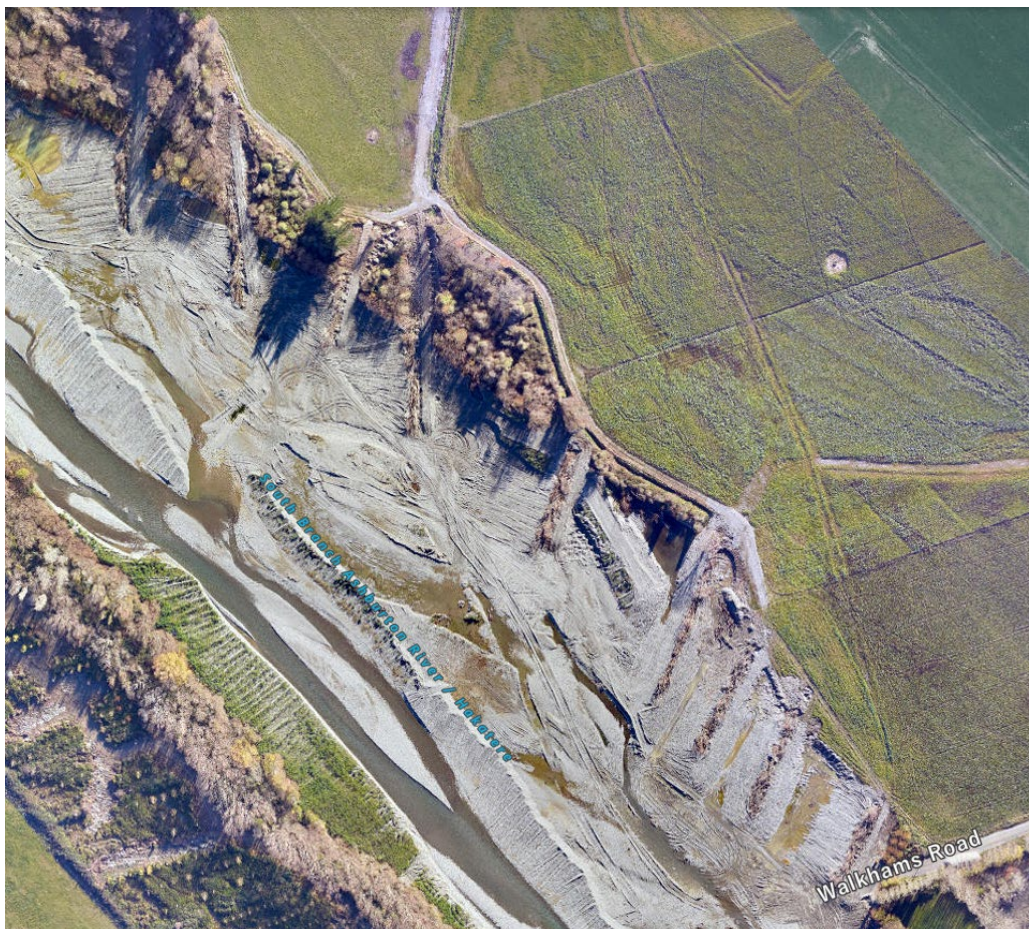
Ashburton South Branch at Walkhams Road, after completion of ATP (May 2022).
